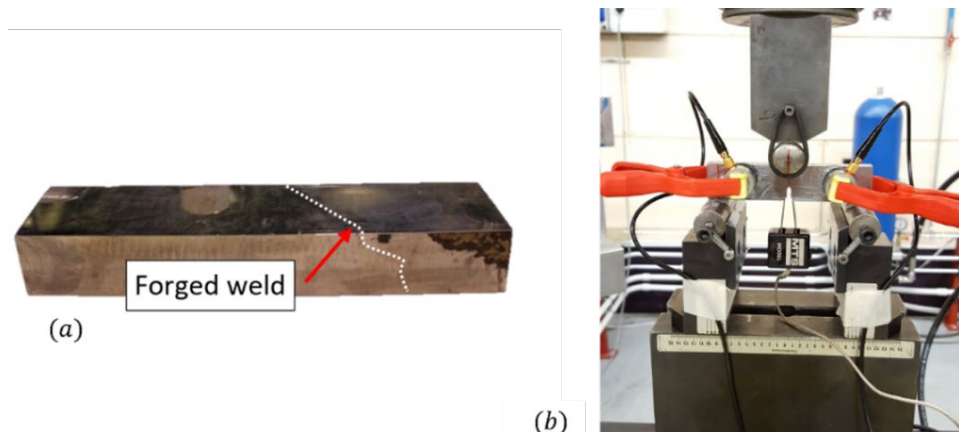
(a) Part of tie-rod T01; (b) Fracture mechanics test set up [2].
